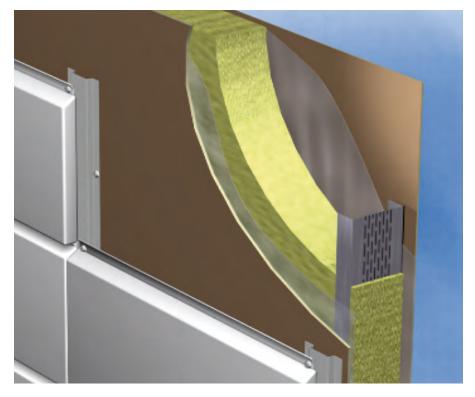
Slotted studs used with mineral wool and metallic cladding Ruukki
